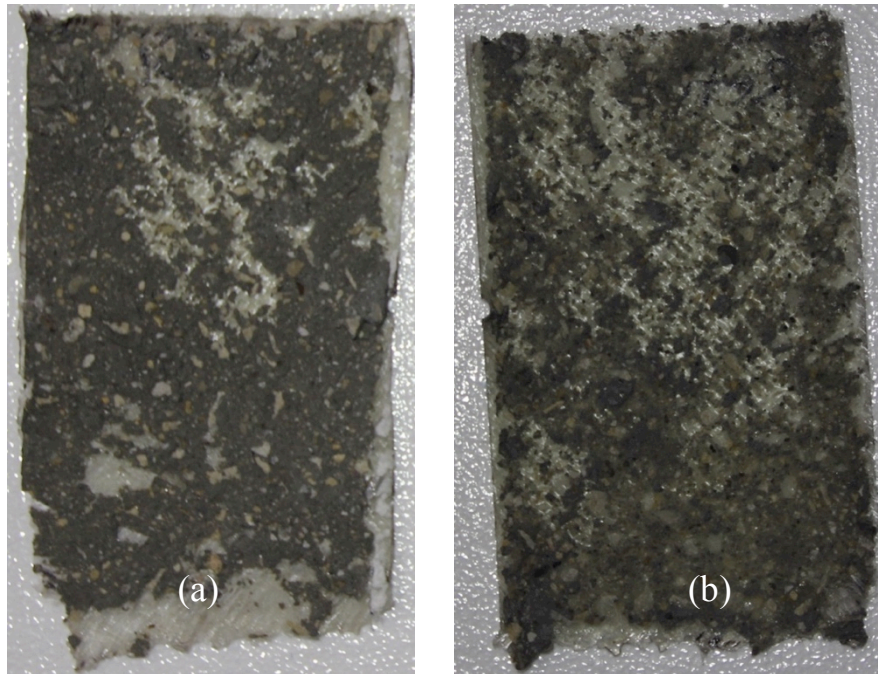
Typical delaminated GFRP concrete removal: (a) surface retarder with single-pass wash specimen; (b) surface retarder with multiple-pass wash specimen.
